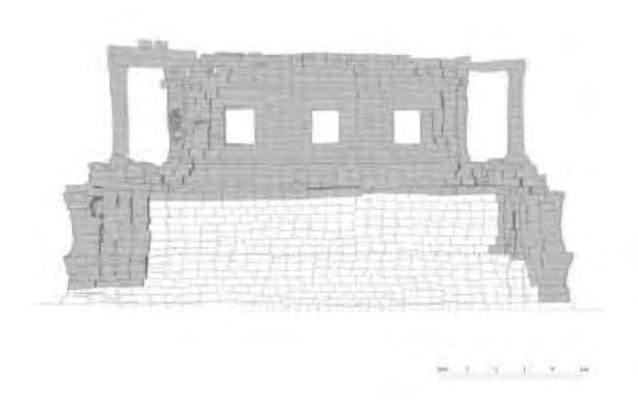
Southern Library of Bayon, South Elevation.
